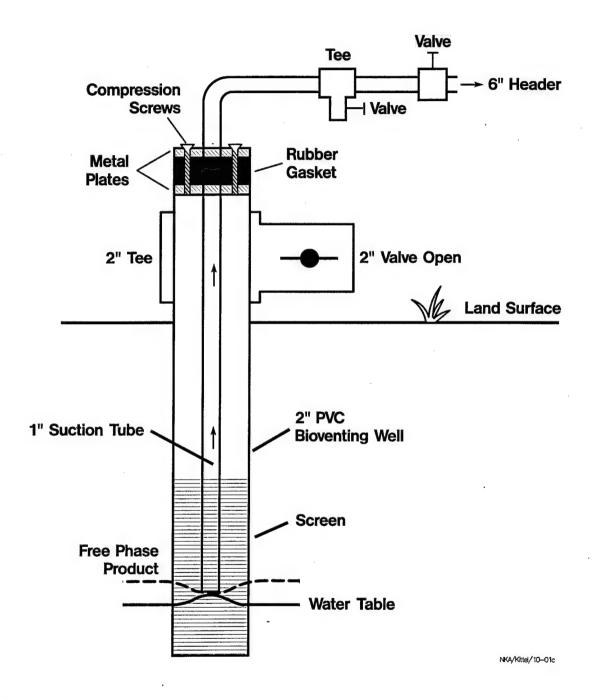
Slurper Tube Placement and Valve Position for the Skimmer Pump Test
